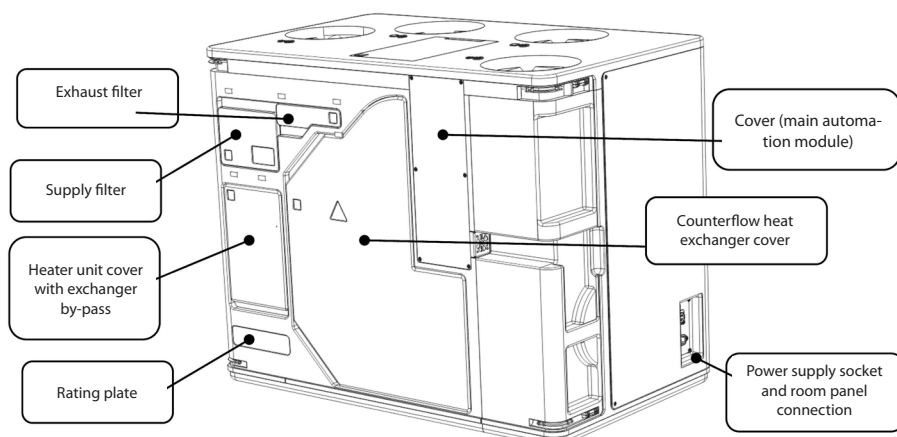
BLAST compact AHU – view of the device after removing the inspection cover
